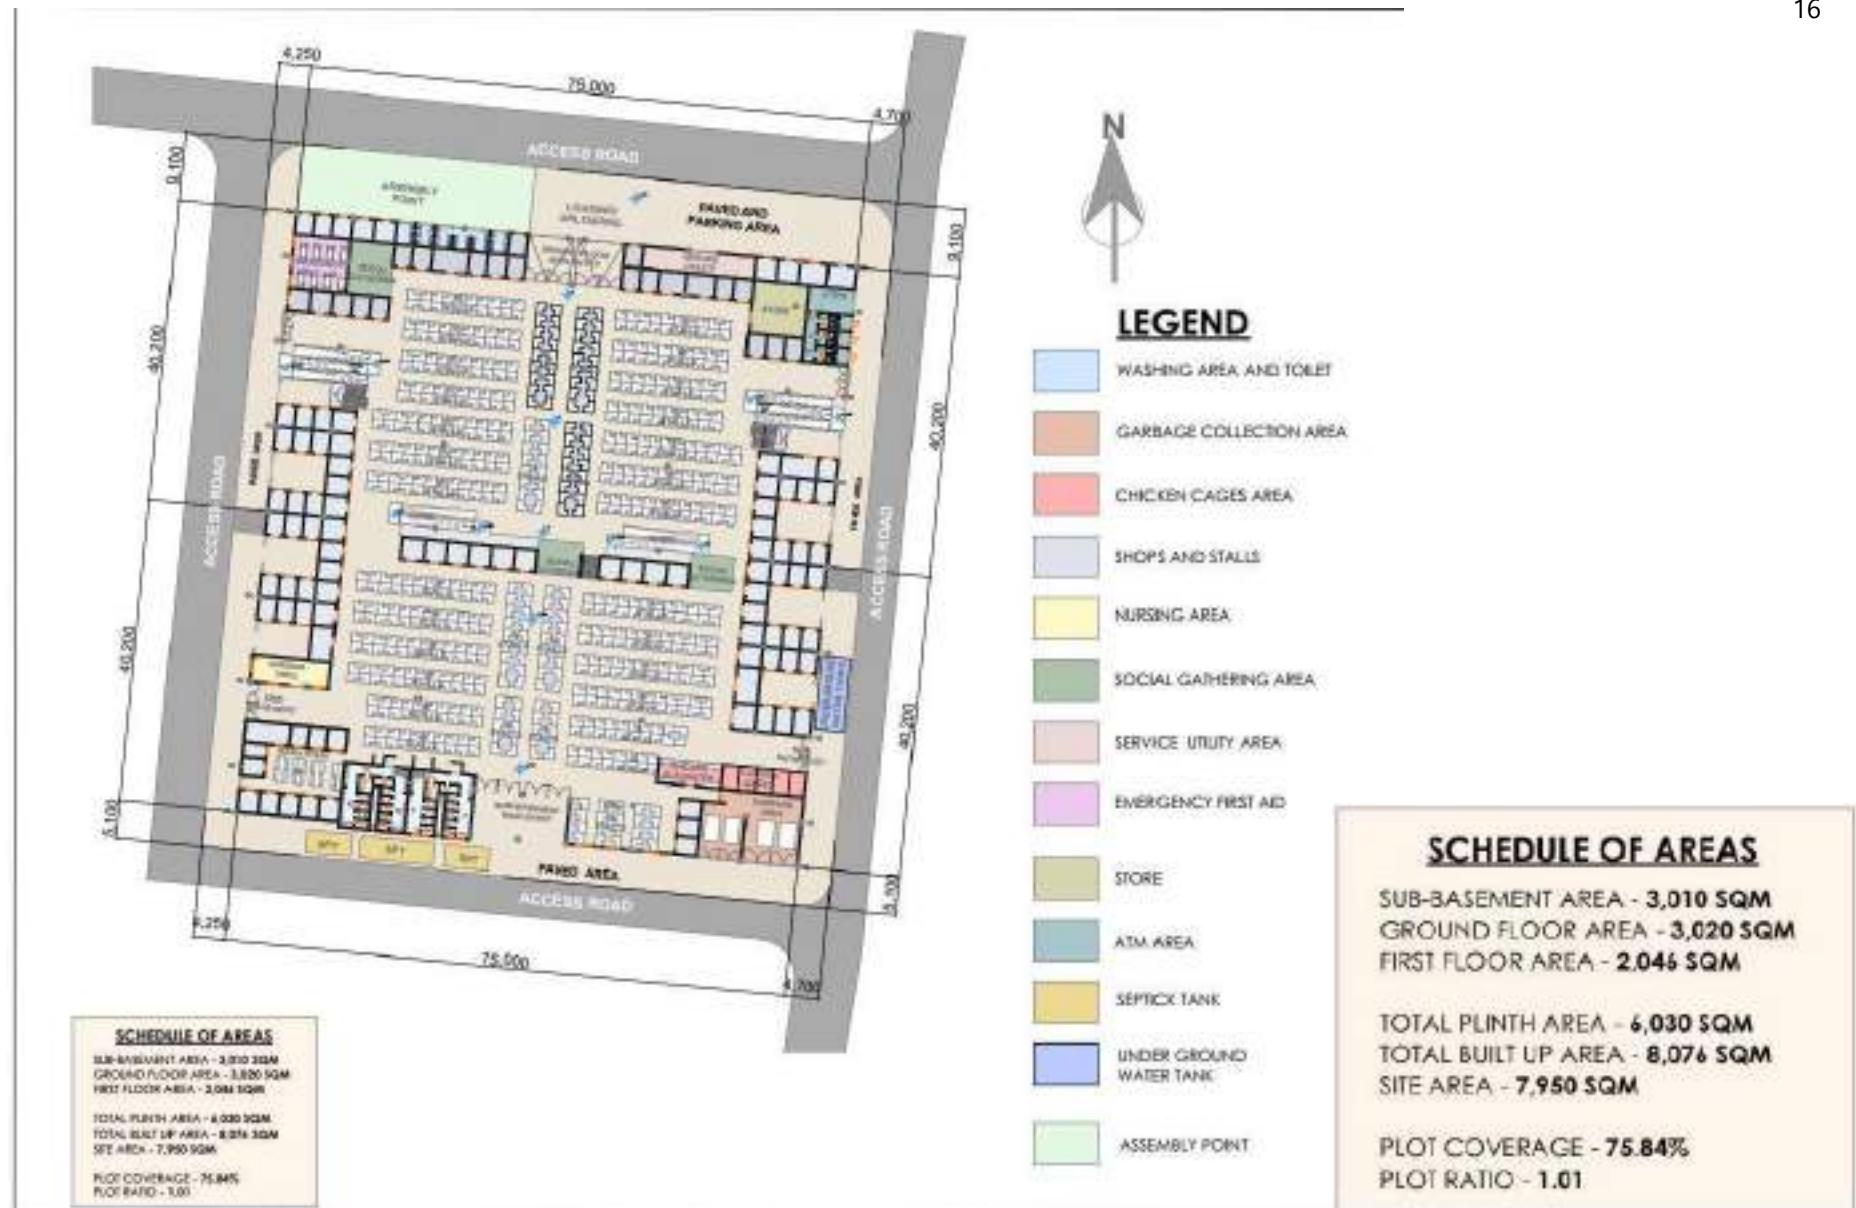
Layout of the proposed Improvement of Sokomatola Market
